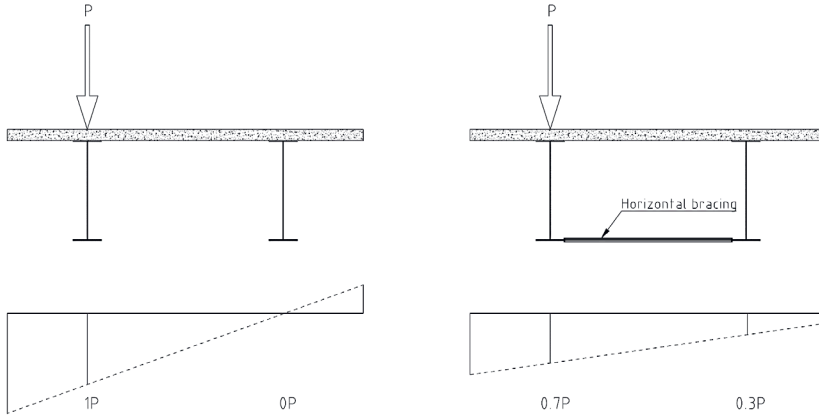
Distribution of an eccentric load (P) for a twin I-girder composite bridge without and with a horizontal bracing.
